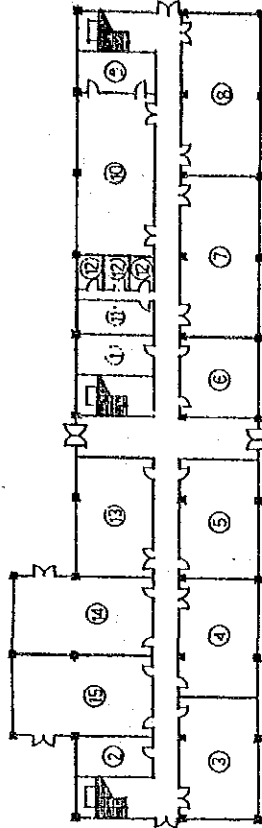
Layout Plan of Facilities for Maritime Safety Training Center
